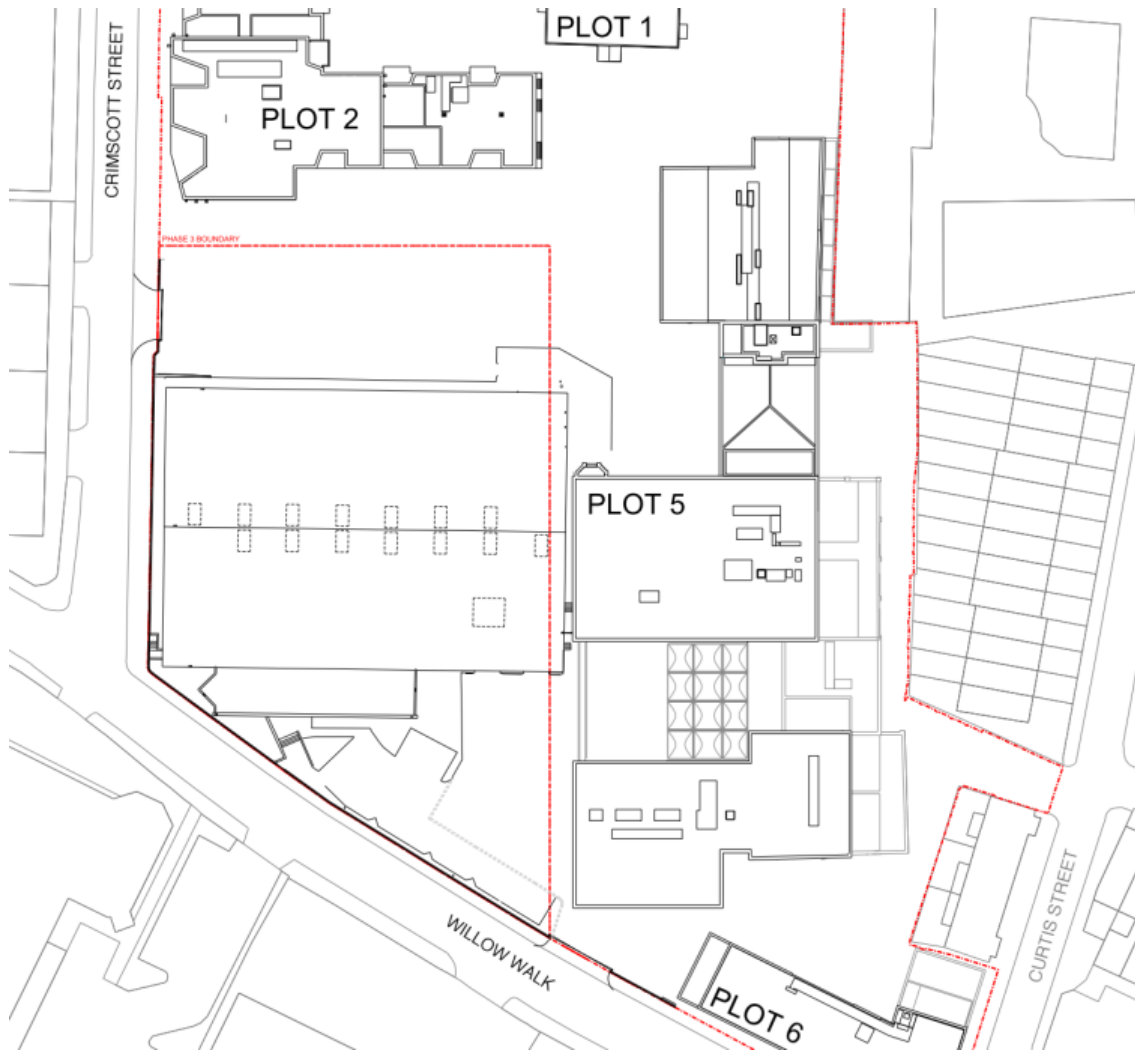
(above): Existing site layout plan within the context of the first two phases of the wider Rich Estate redevelopment
